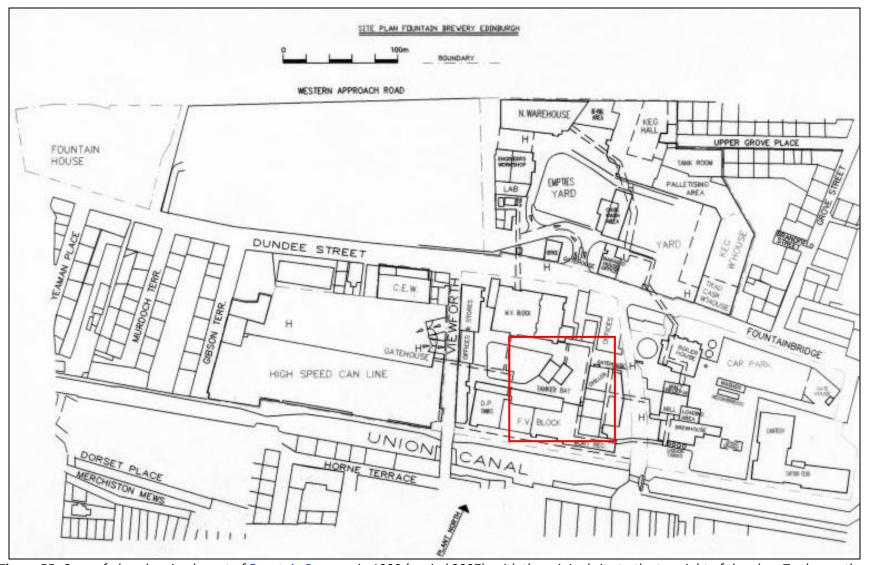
Copy of plan showing layout of <u>Fountain Brewery</u> in 1990 (copied 2007), with the original site to the top right of the plan. To the south of Fountainbridge/Dundee Street is the result of the 1973 expansion when the brewery extended into the recently vacated North British Rubber Company premises. The area in red marks the site of the former Castle Silk Mills (SC1073277 ©Crown Copyright HES)
